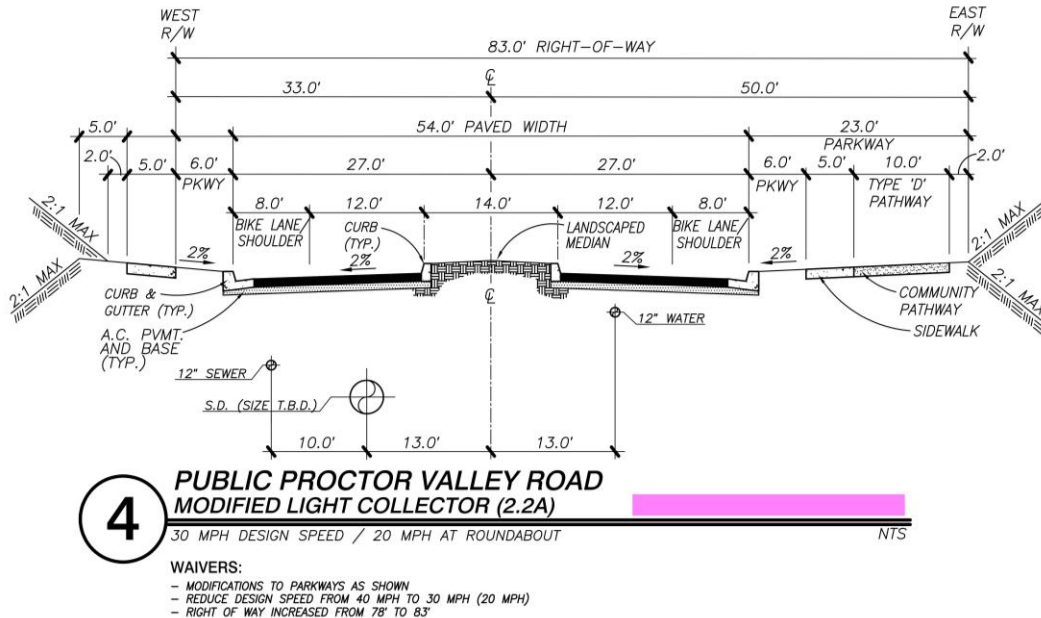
Street Section 2 - Proctor Valley Road
